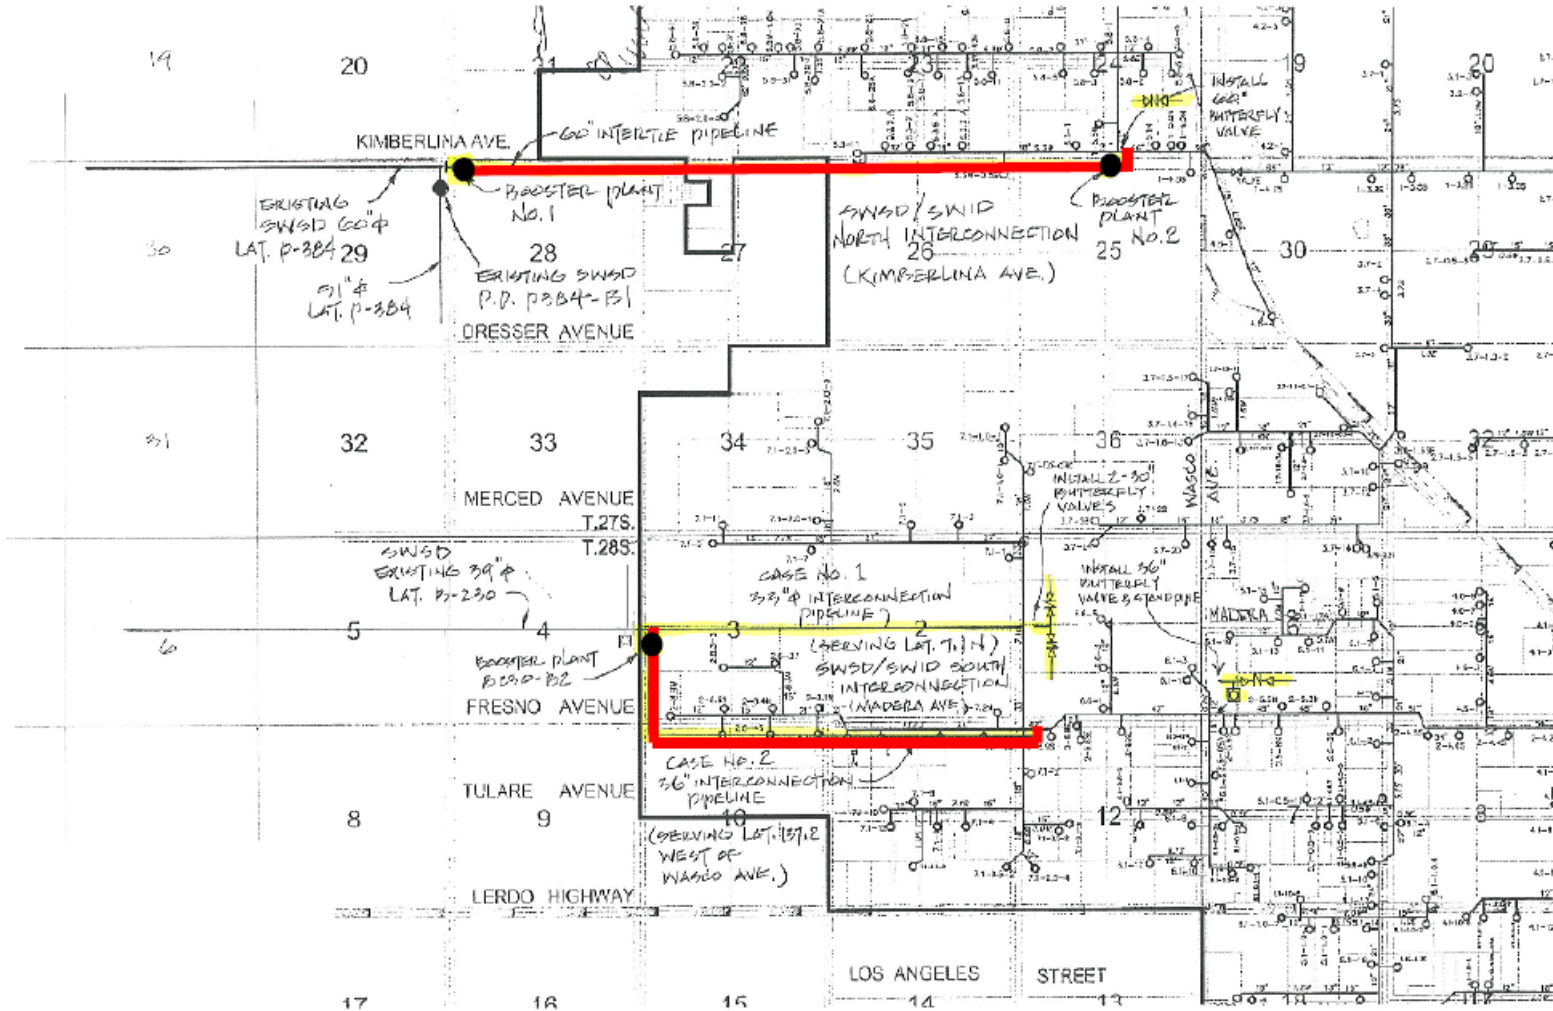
Proposed Kimberlina Road and Madera Avenue Interconnections between Semitropic Water Storage District and Shafter-Wasco Irrigation District
